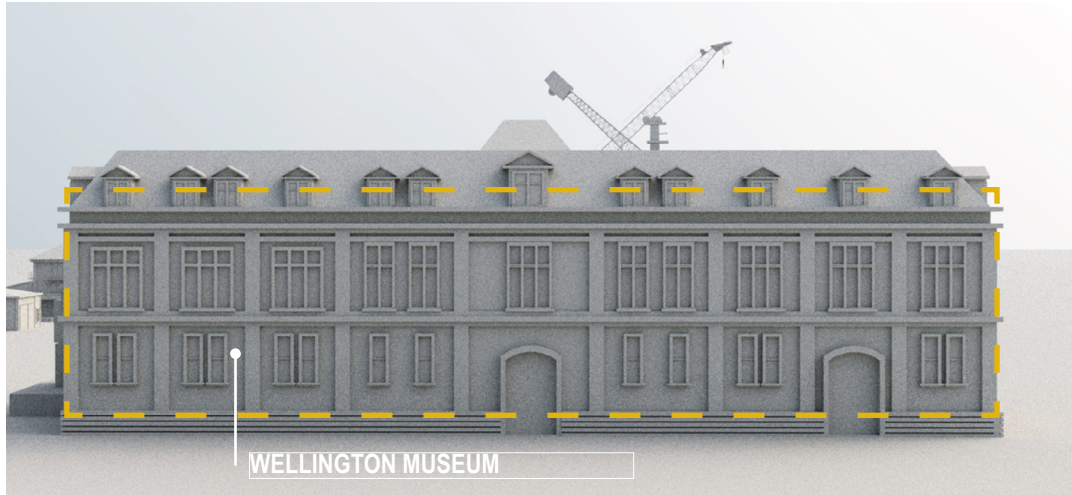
East elevation of the historic Bond Store Building, indicating the location of the Wellington Museum plus internal museum office.
